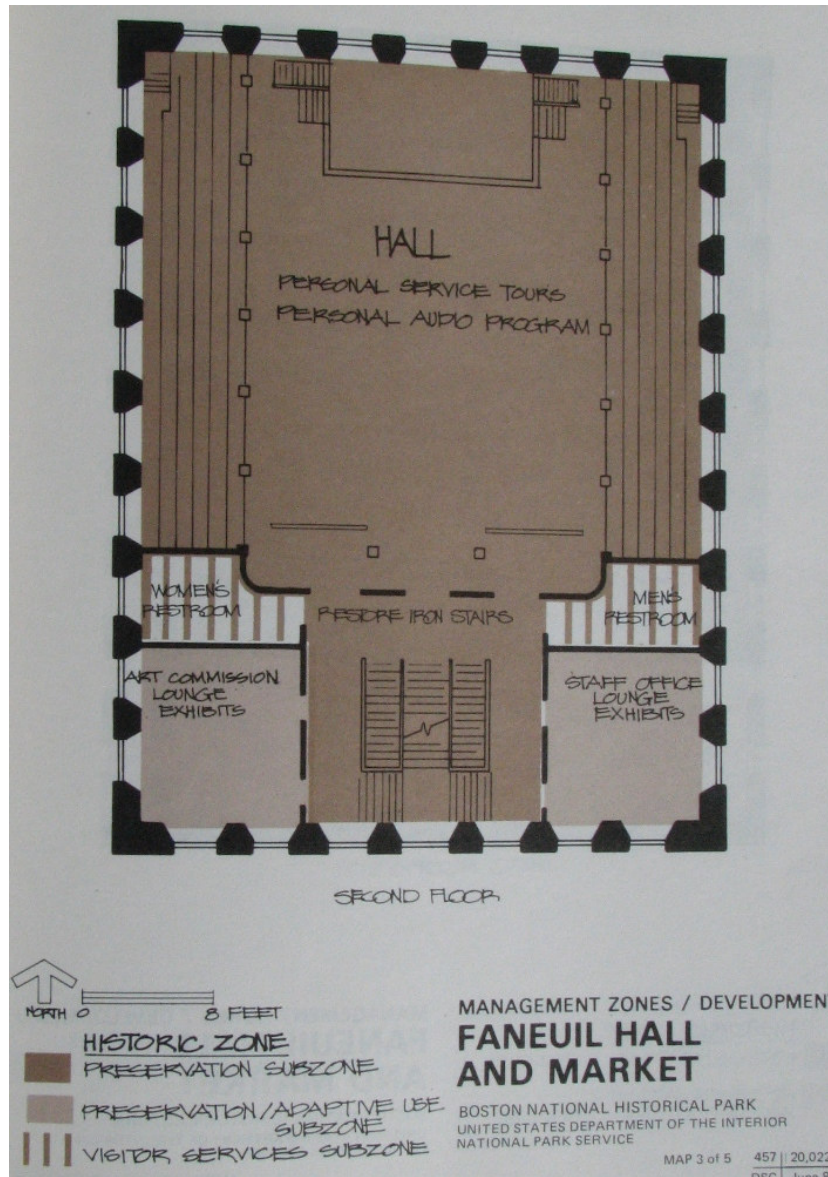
Second floor plan of the Faneuil Hall (General Management Plan 1980) p. 63
